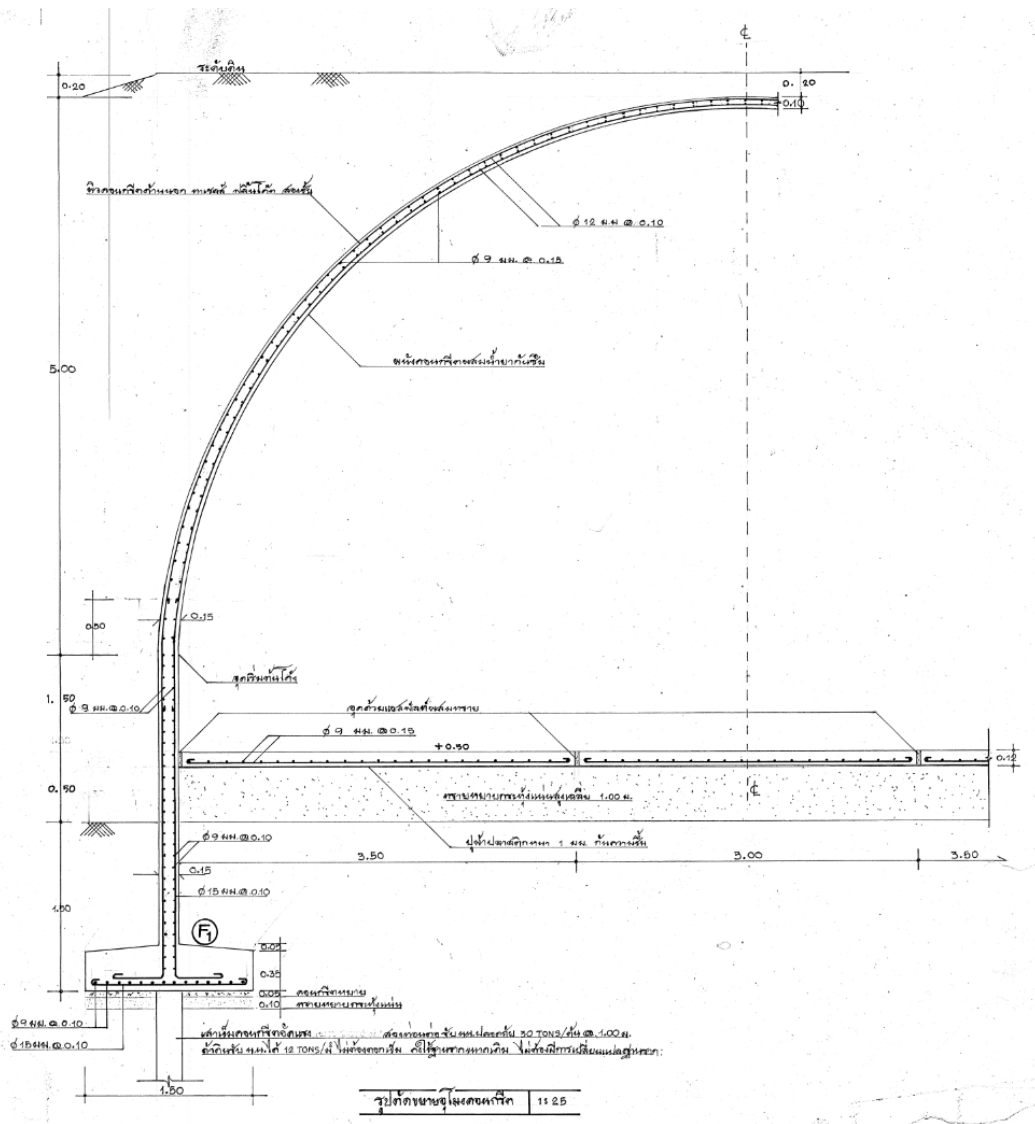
Construction drawings of the existing Ammunition storage in Thailand
